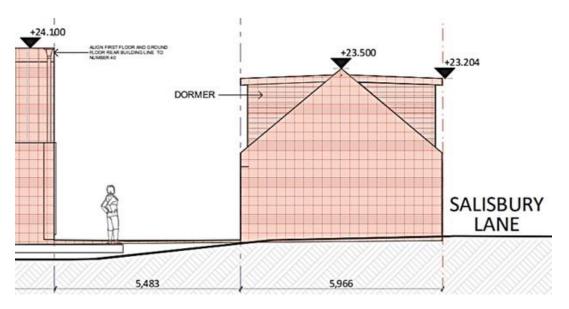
South elevation of garage/studio buildings approved at 38 Princess Avenue.
